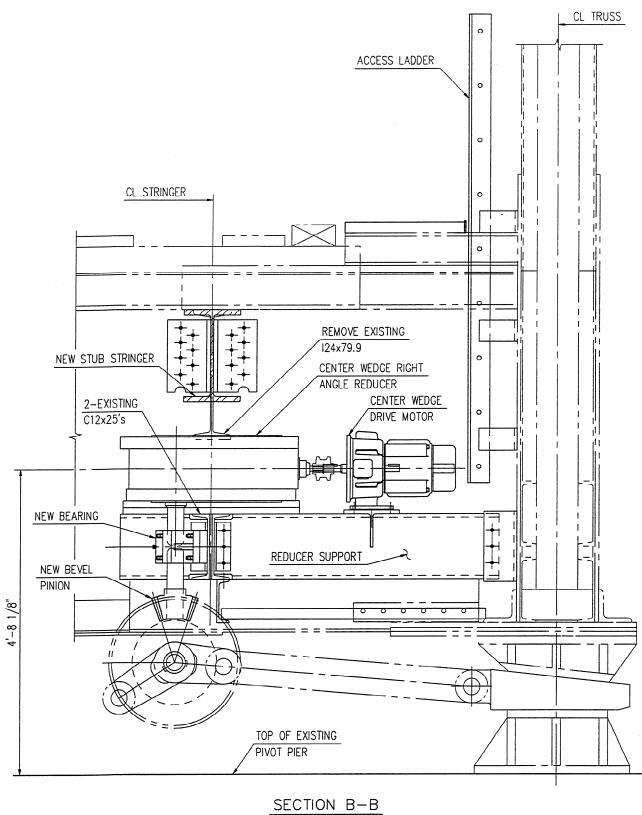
Cross Section View of the Center Wedge Drive Machinery
